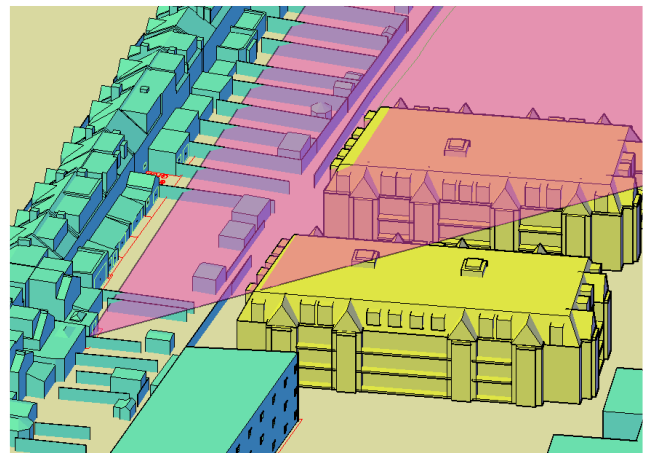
25-degree plane from potentially affected windows at 57-75 Grosvenor Avenue on ground floor intersecting with the proposed development
